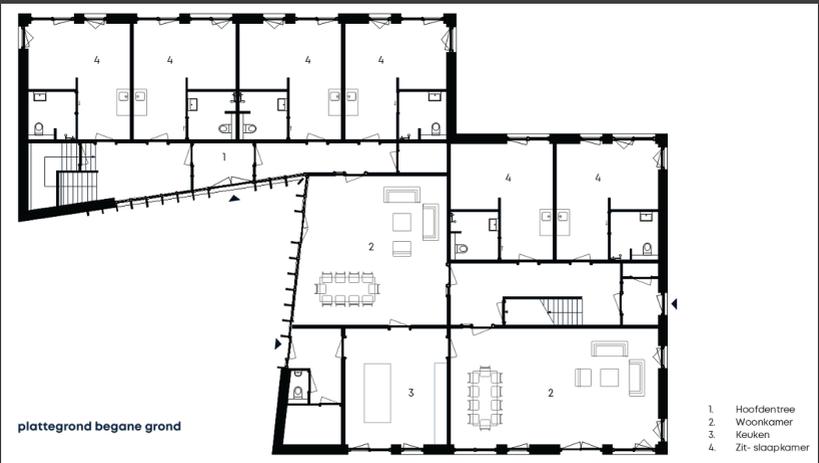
Floor plan of ground floor (9graden architectuur, 2022).
